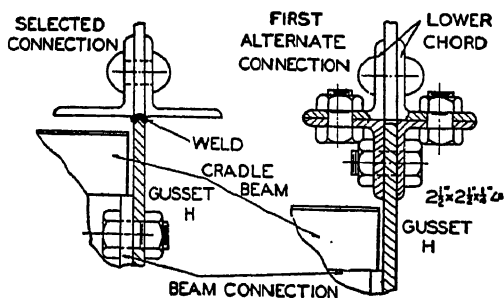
Enlarged Views of Details for Joint *L*.
